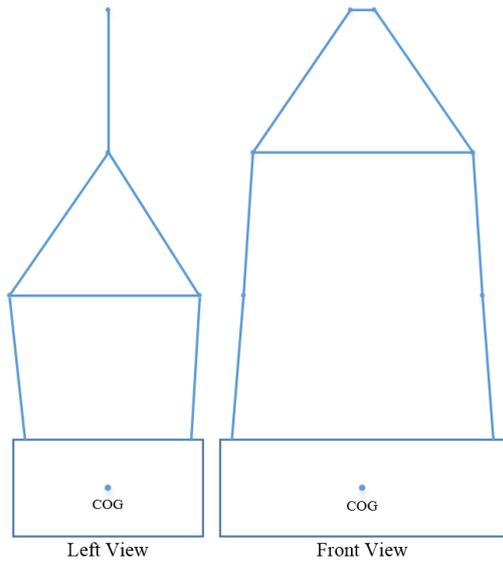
Left and front view of the rigging assembly for a 4-point pick module
